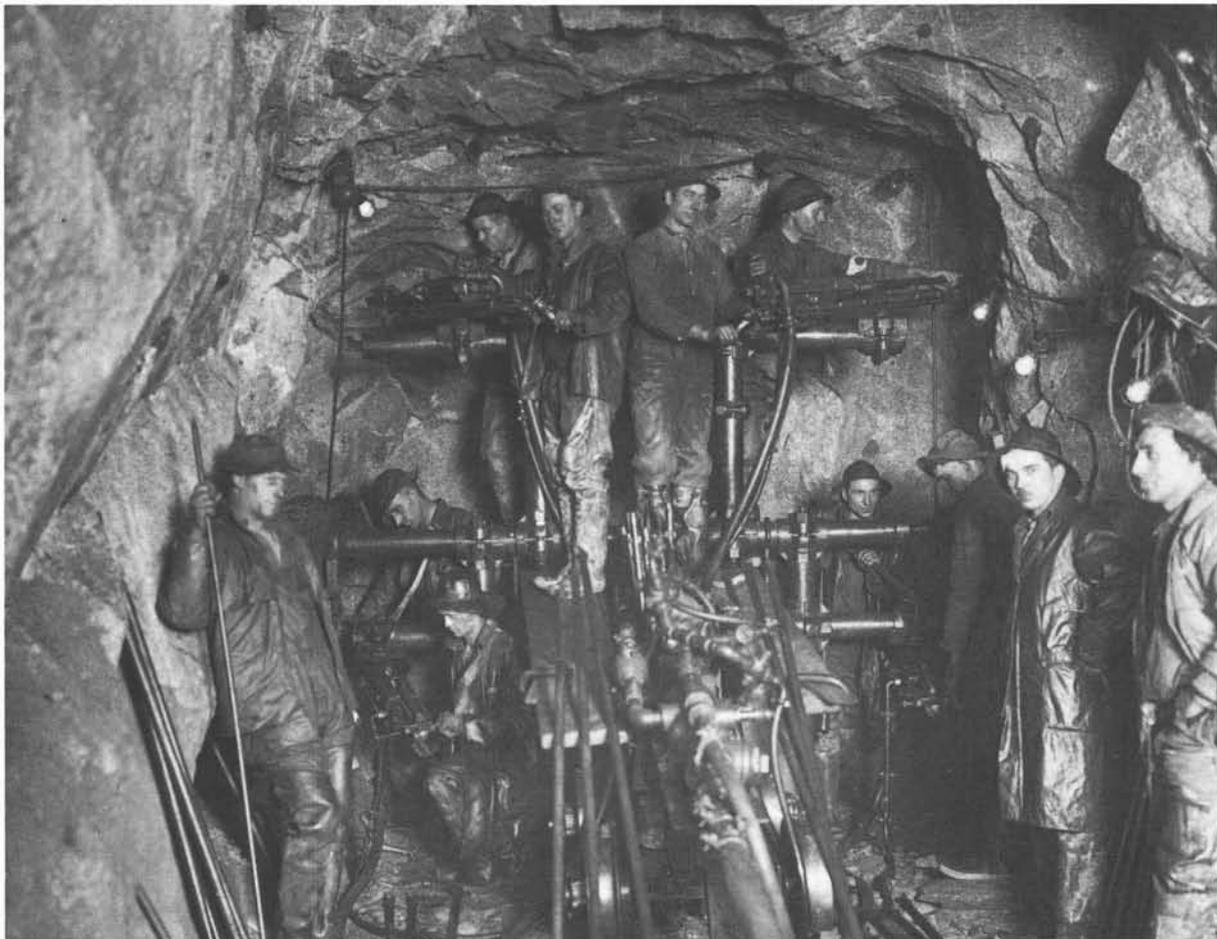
Sullivan drill carriage in center heading. Courtesy of Special Collections Division, University of Washington Libraries; photo by L. Pickett, negative 3762.
